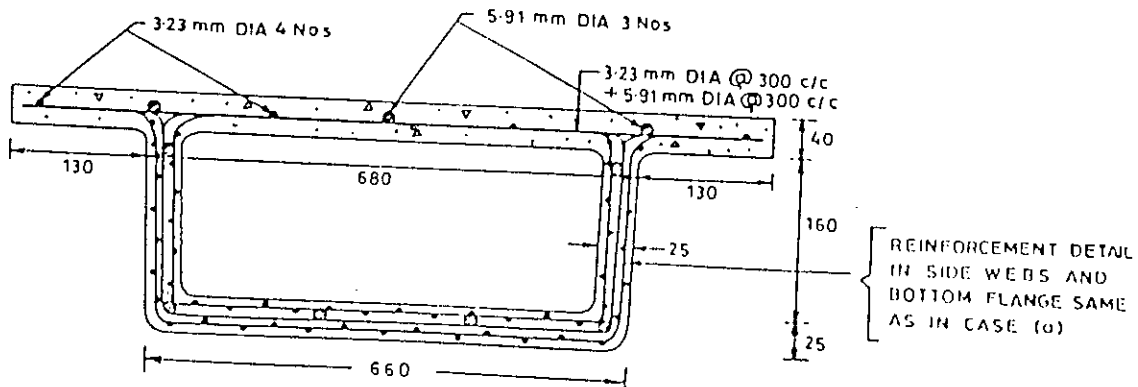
STRUCTURAL DETAILS OF PRECAST R.C.C DIAPHRAGM
